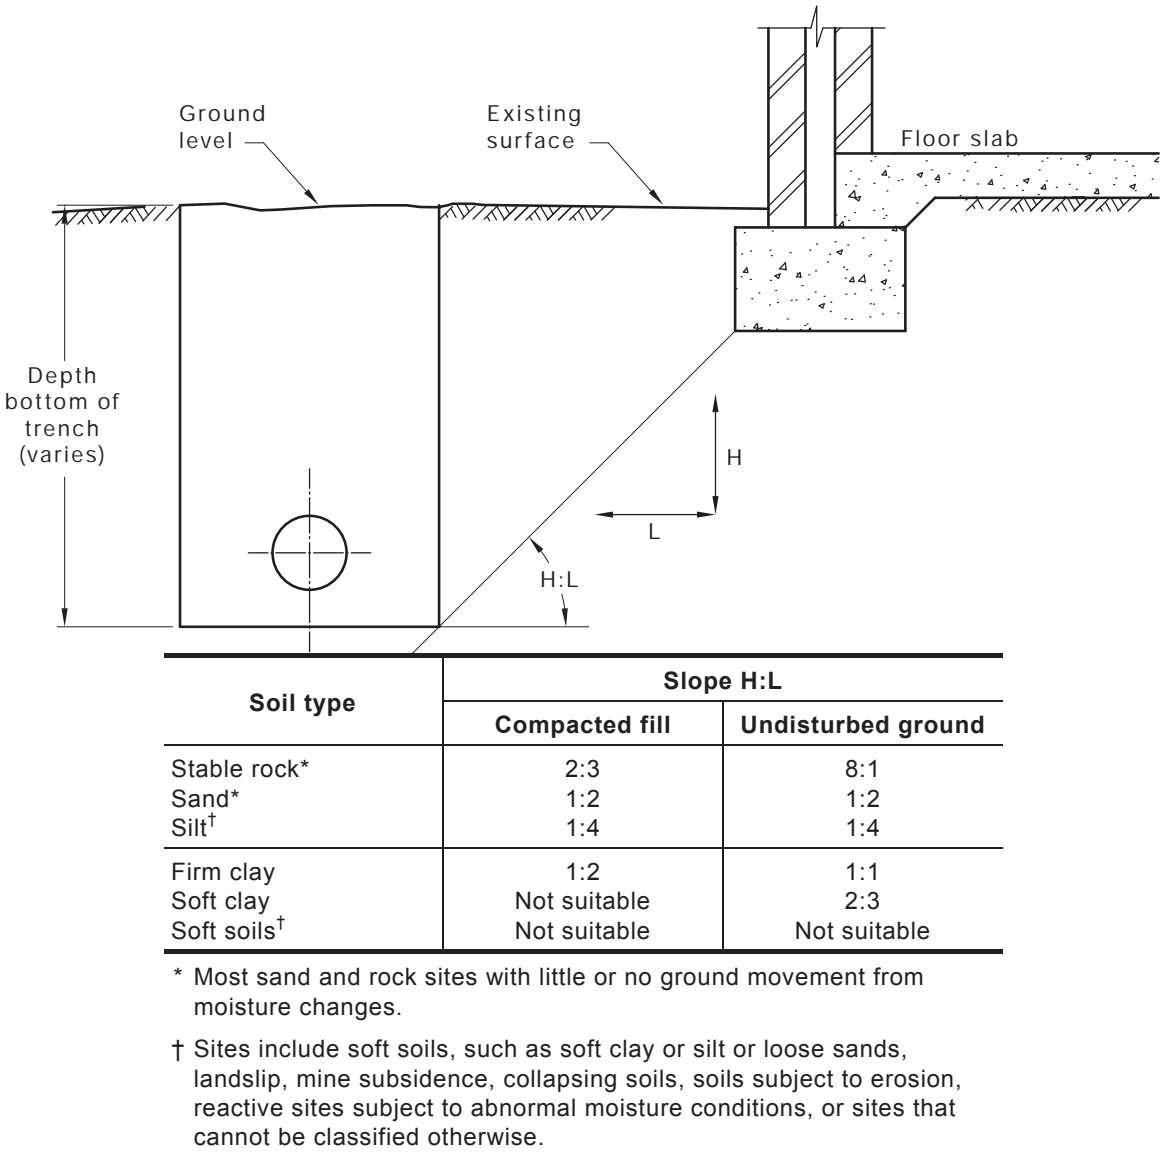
EXCAVATION NEAR FOOTINGS
